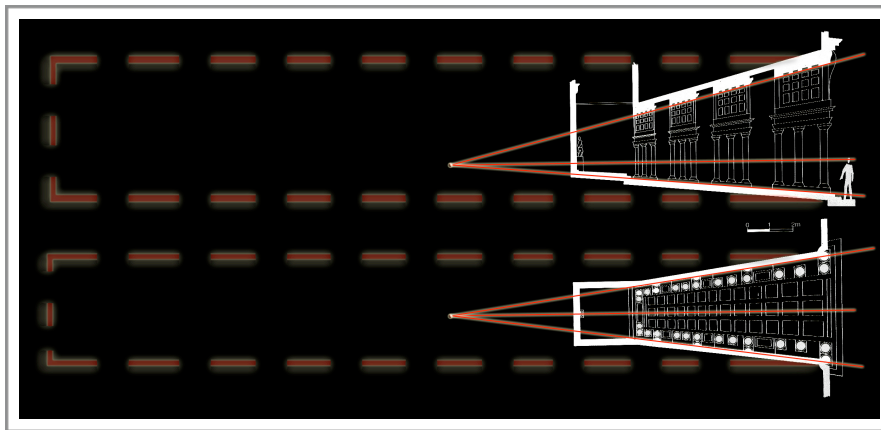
Sectional and plan view of the structure, showing the actual and perceived sizes. The ceiling, floor, and walls are inclined seeming to converge towards a single point in the distance. (Analysis of image from [67])
